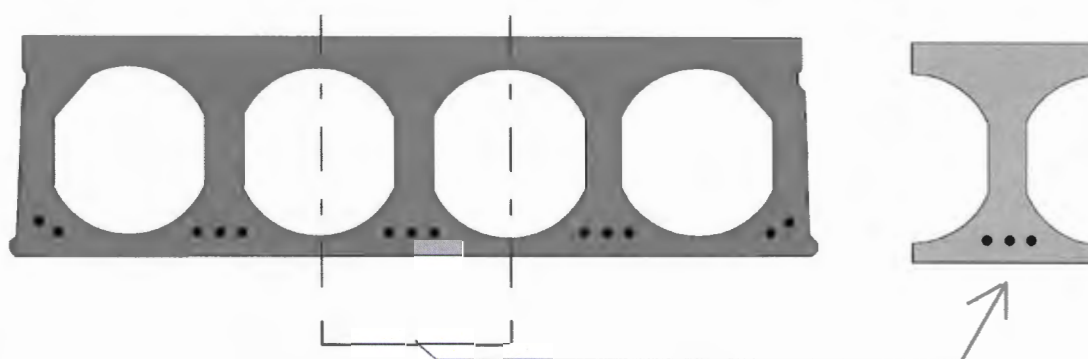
Typical cross-section of a prestressed Hollow Core slab and an I-section used for structural analysis (Pajari, 2009).
